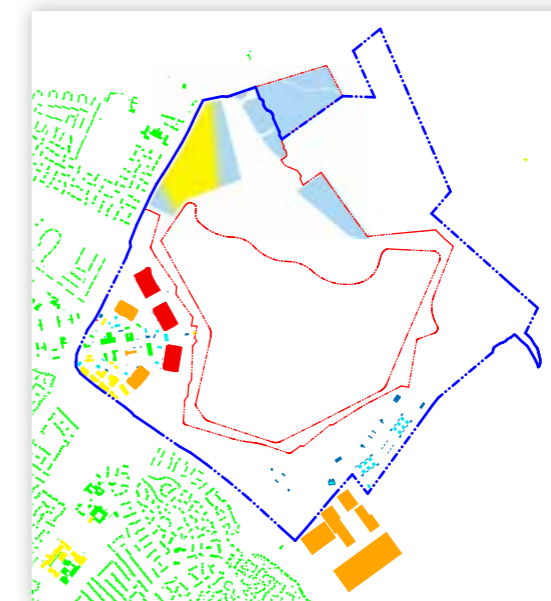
Existing and Proposed Height and Massing Parameters Plan for 1st Pre-application
